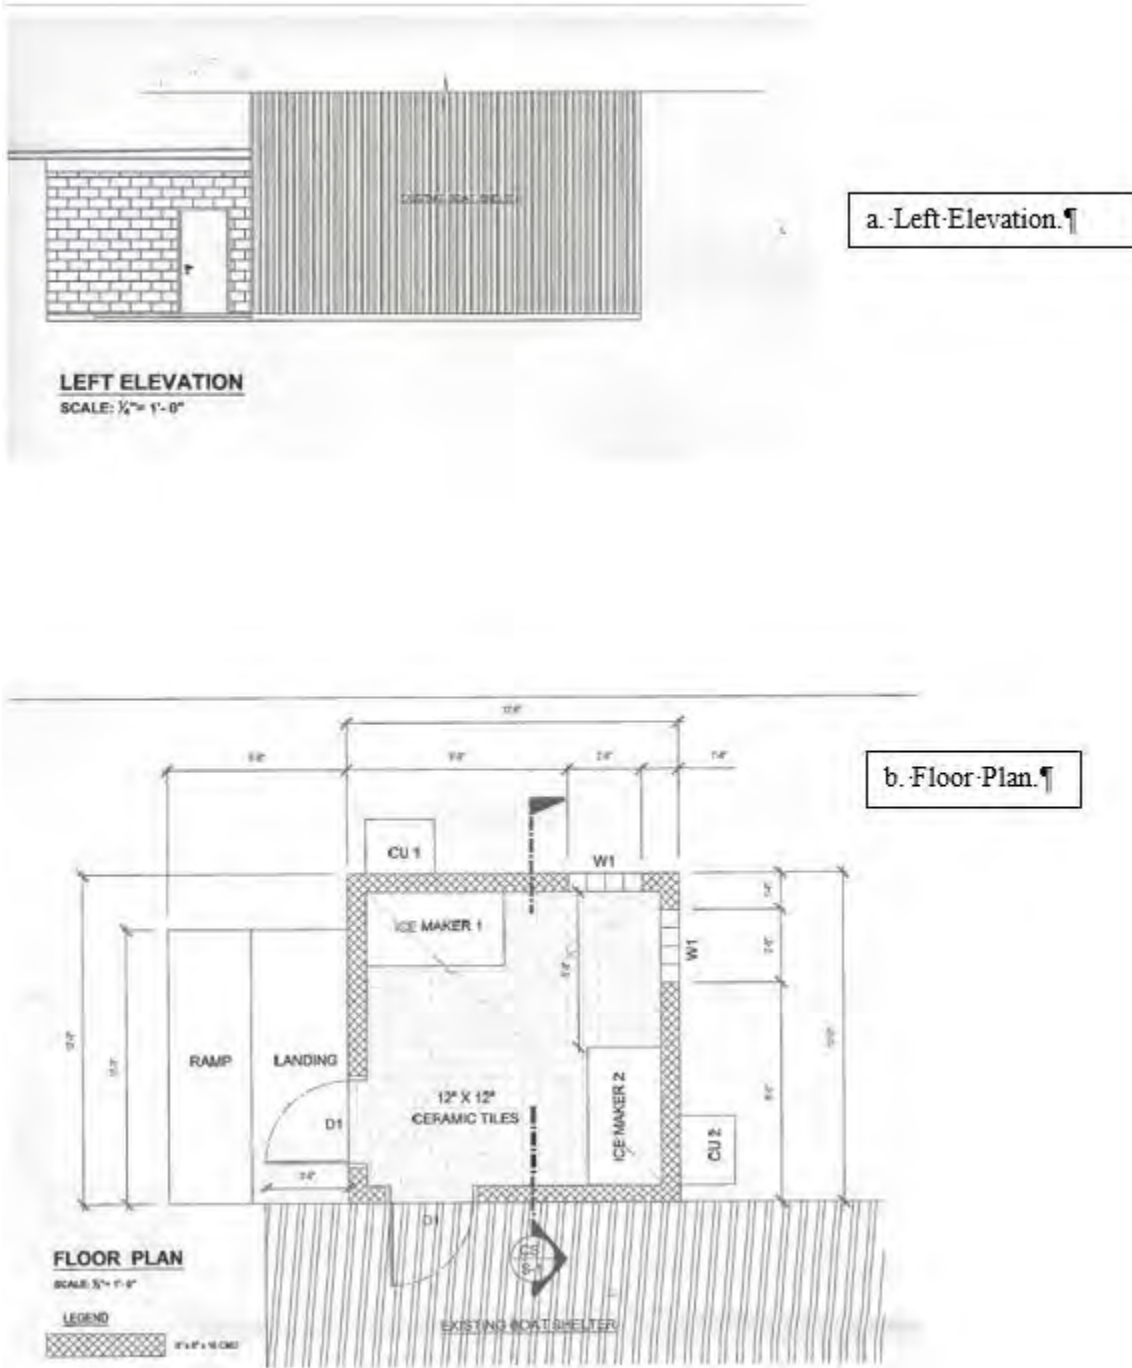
Selected Ice House plans: a) side elevation; b) floor plan. Source: American Samoa Dept. of Public Works 2019.
